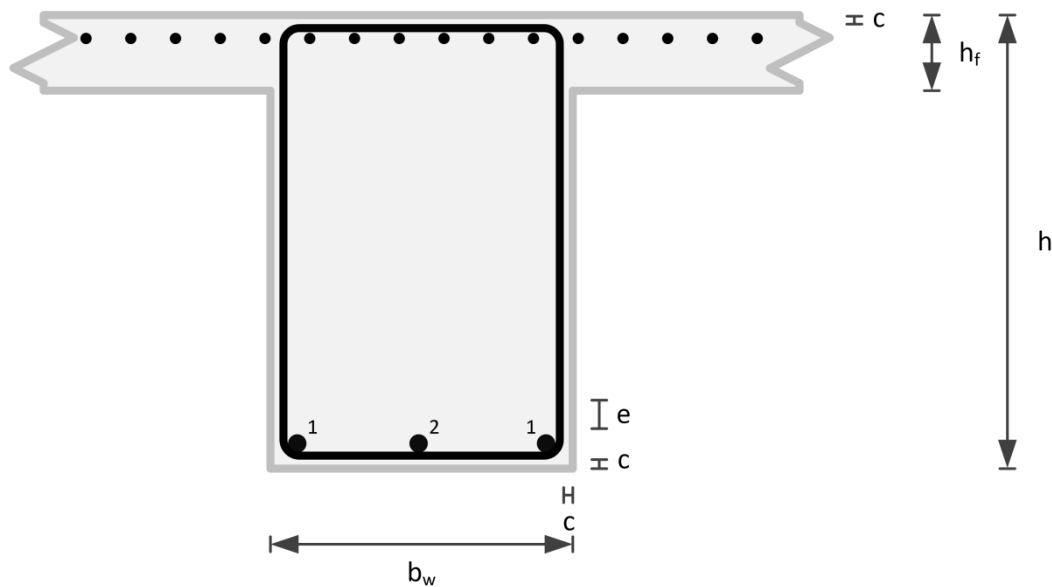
| Cross-section of the reinforced concrete T-beam which is clamped
